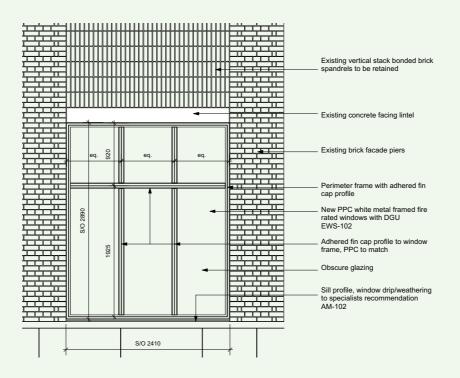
DETAIL FACADE VIEW - EAGLE WHARD ROAD, ISLINGTON (BGY)
